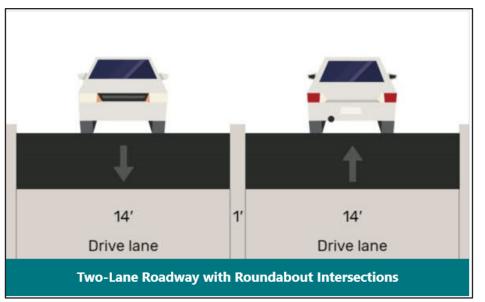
Two-Lane Section with Roundabouts – South of SE Leadbetter Road (RB2).
